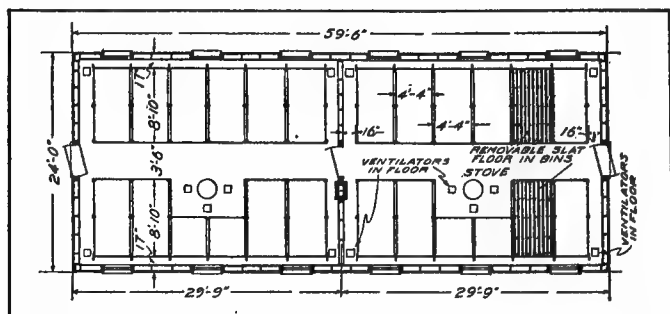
Floor plan of a 24 by 60 foot sweet potato storage-house having a capacity of about 5,200 bushels.
